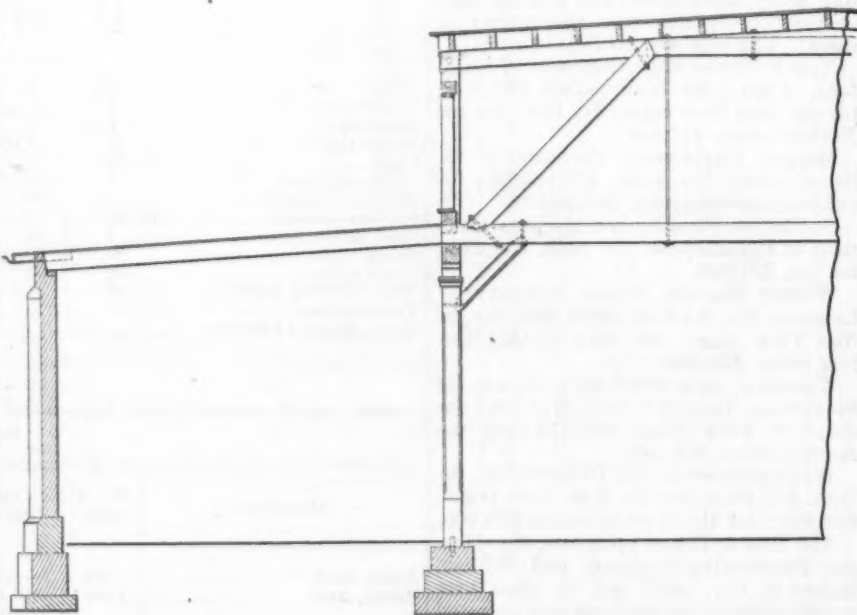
Half Cross Sectional Elevation of Wire Mill.
